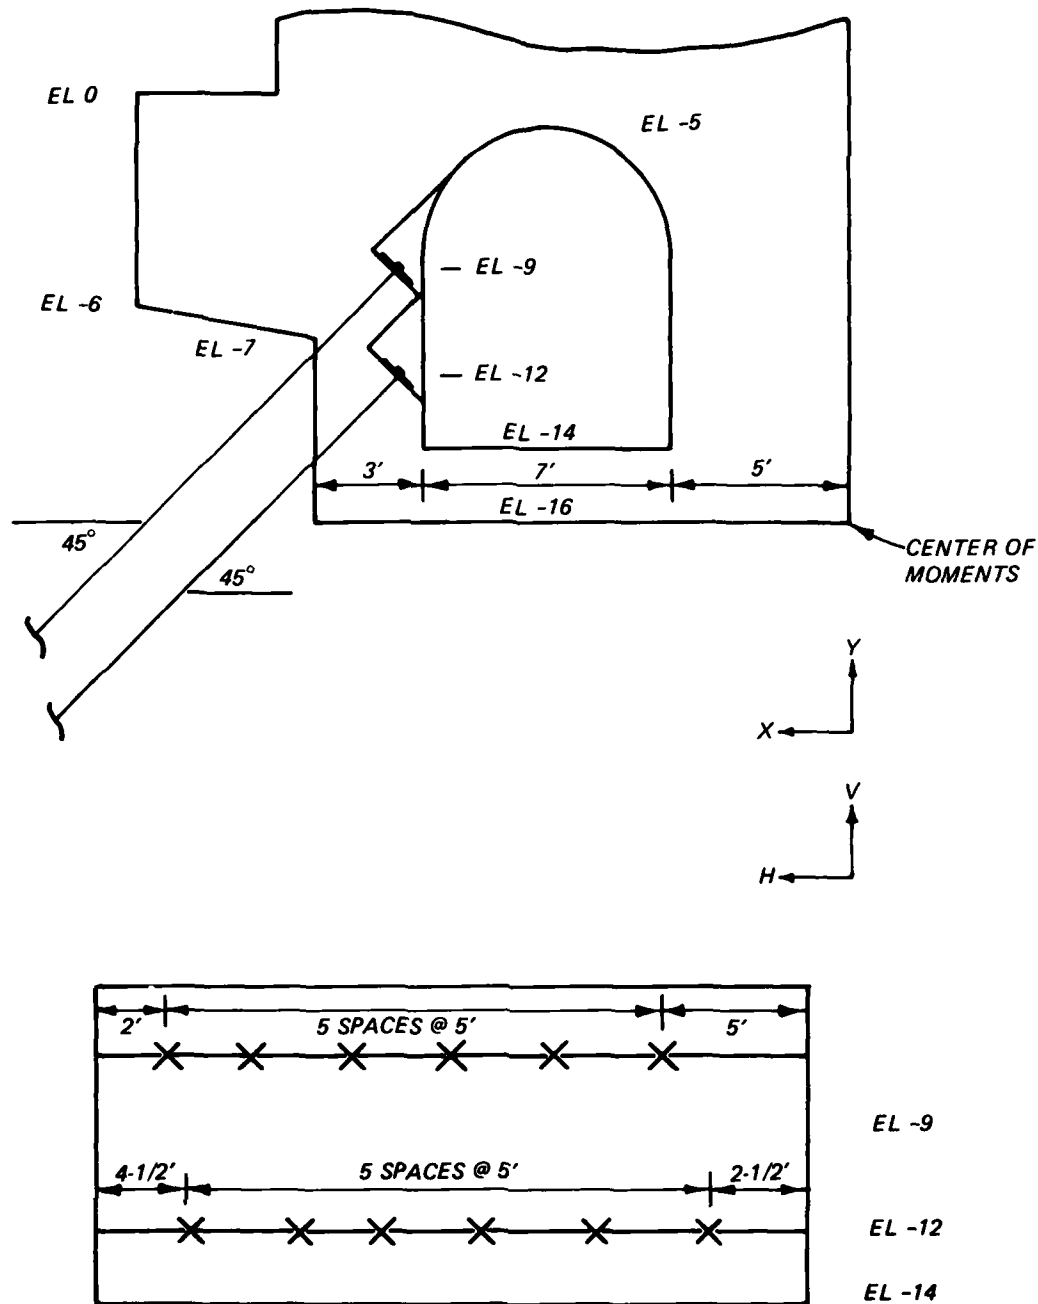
Monolith L-5, posttensioning through the filling and emptying culvert walls to meet overturning requirements
